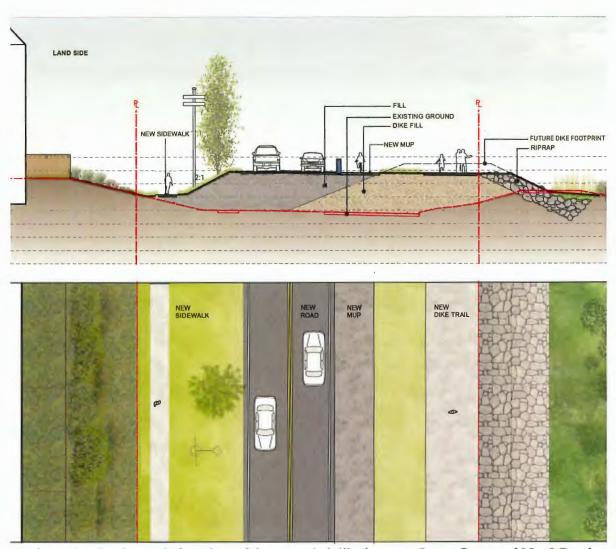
Section and plan view of the upgraded dike between Lynas Lane and No. 2 Road
